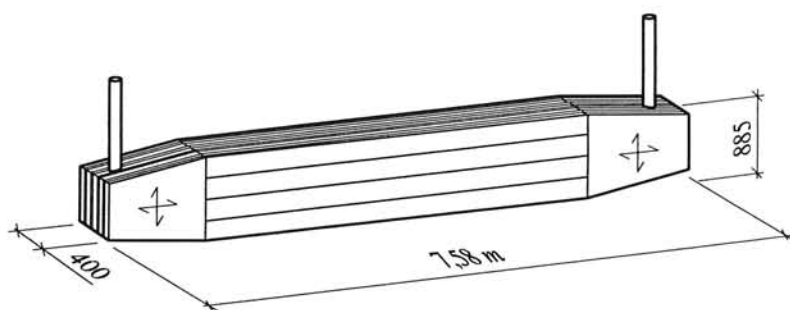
Cross girder with beech plywood reinforcements at the ends.
